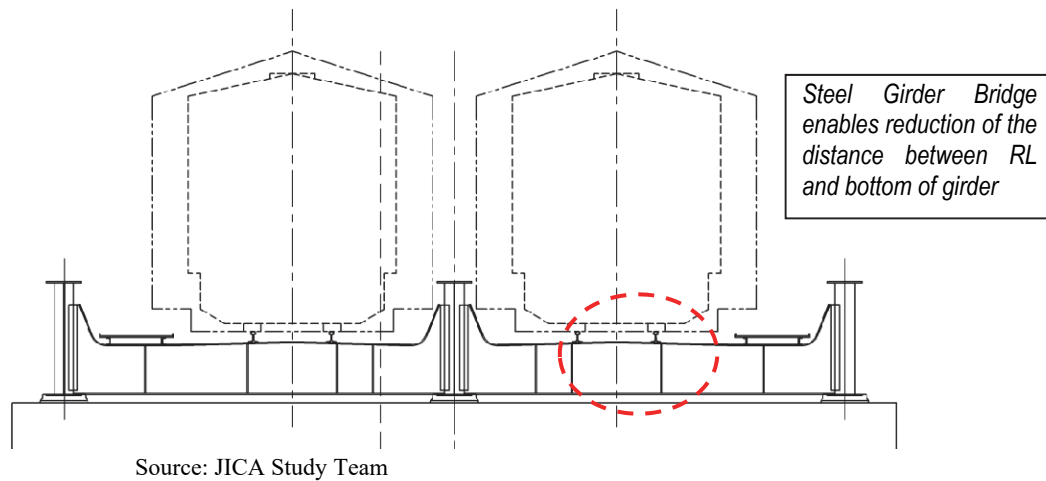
Section of Steel Girder Bridge (Through Plate Girder)
